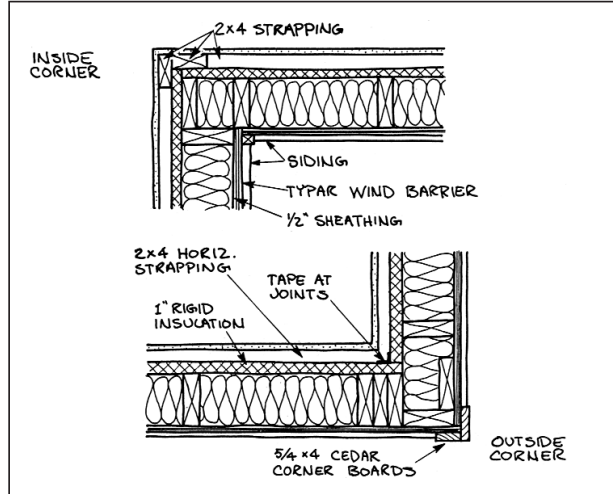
Corner details. Inside and outside corners are detailed such that fiberglass insulation can be added from the inside, after the sheathing is on.
